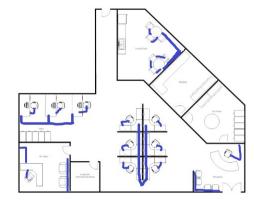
(a): Schematic showing the connections of the desks and chairs on a floor plan.
